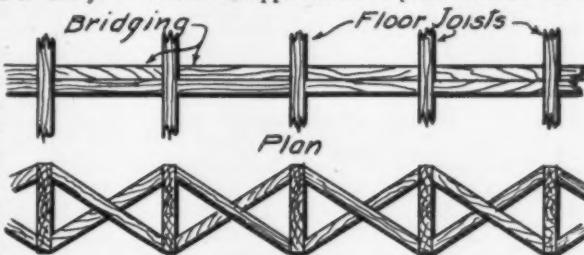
PLAN AND ELEVATION OF "HERRINGBONE" CROSS BRIDGING BETWEEN FLOOR JOISTS.
